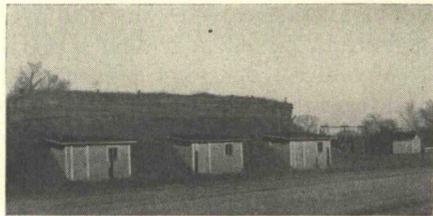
An experimental installation of 42-in. 8-gage pipe under 15 ft. untamped fill at Ames, Iowa.
